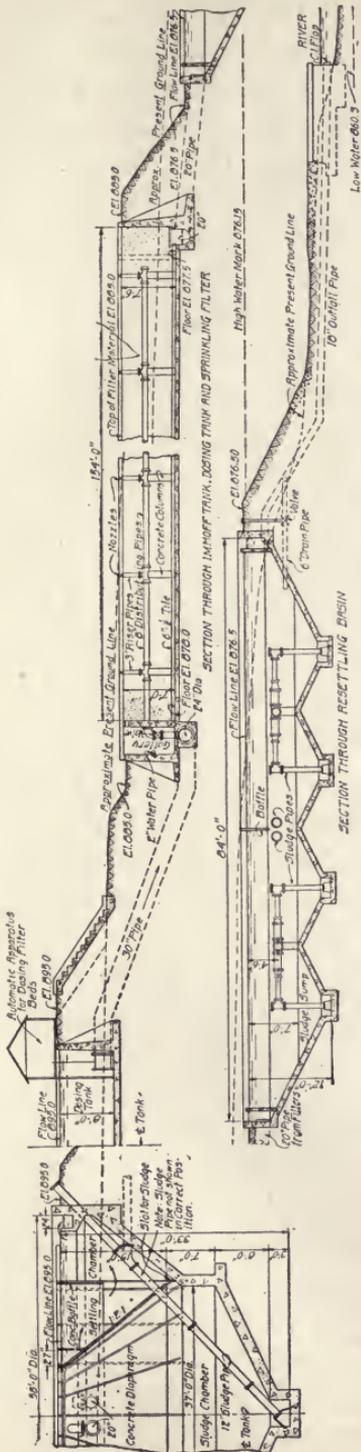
Section of Sewage Disposal Plant at Connellsville, Pennsylvania
